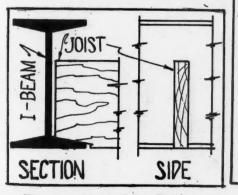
Wood Joist Resting on Flange of Steel Beam Where Heavy Beams with Wide Flanges Are Used
